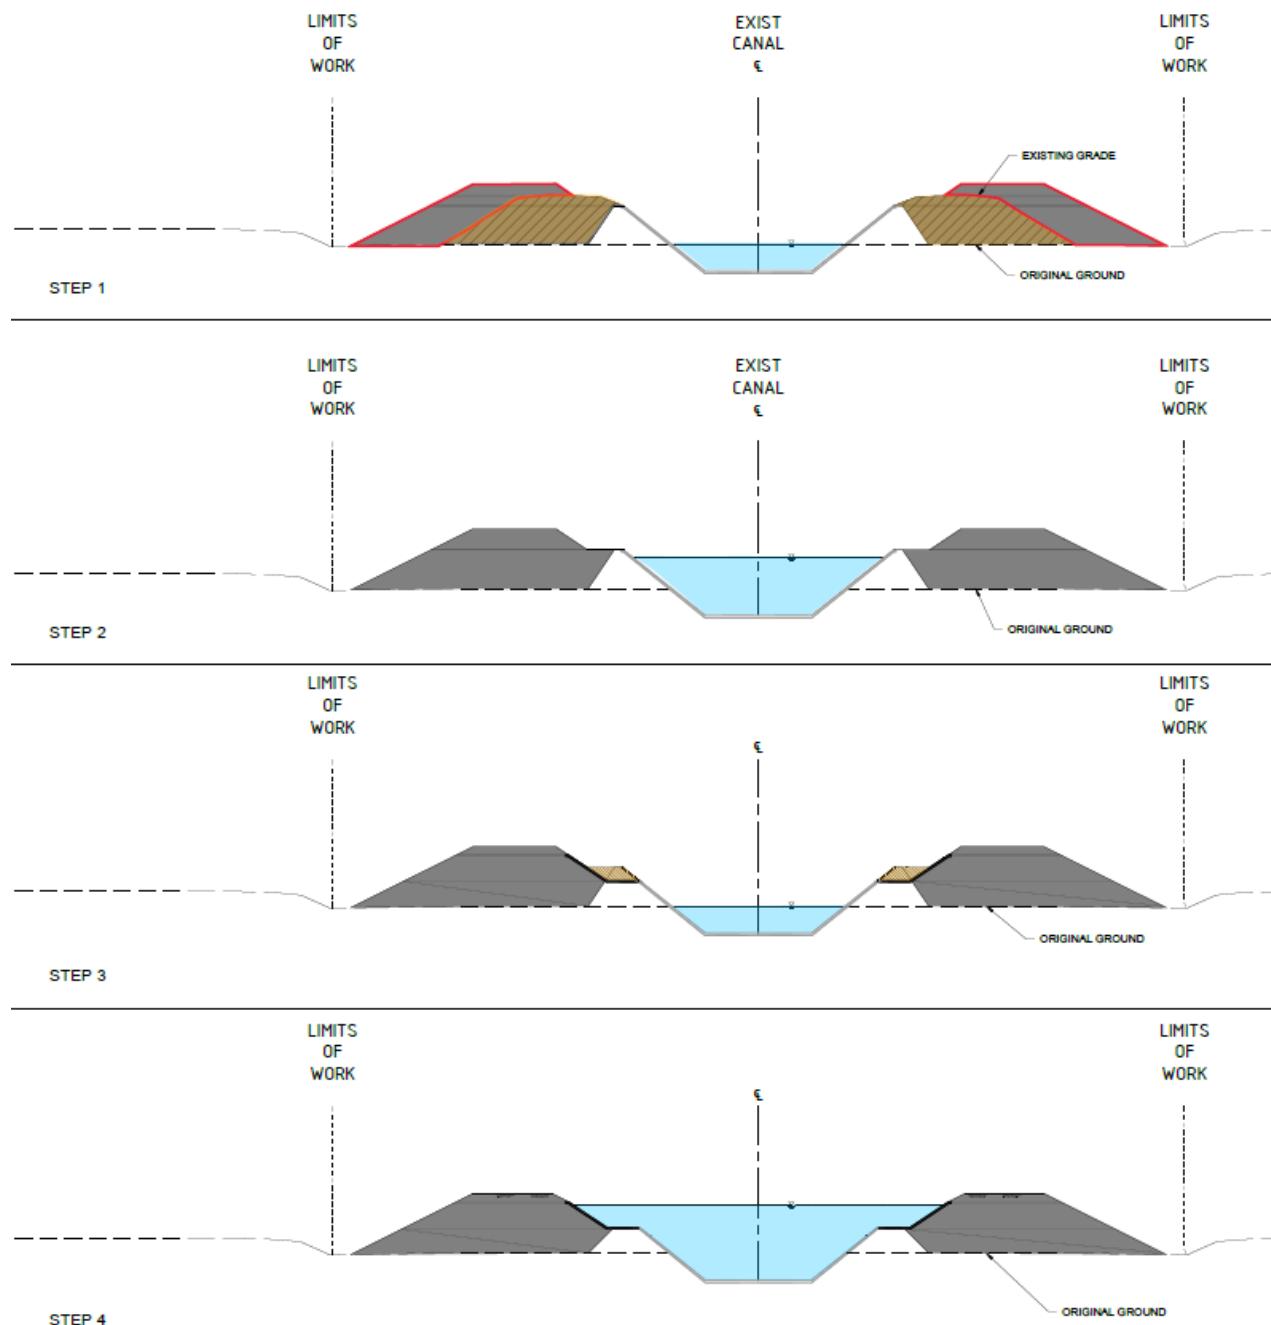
Canal Enlargement Construction Sequencing Steps
